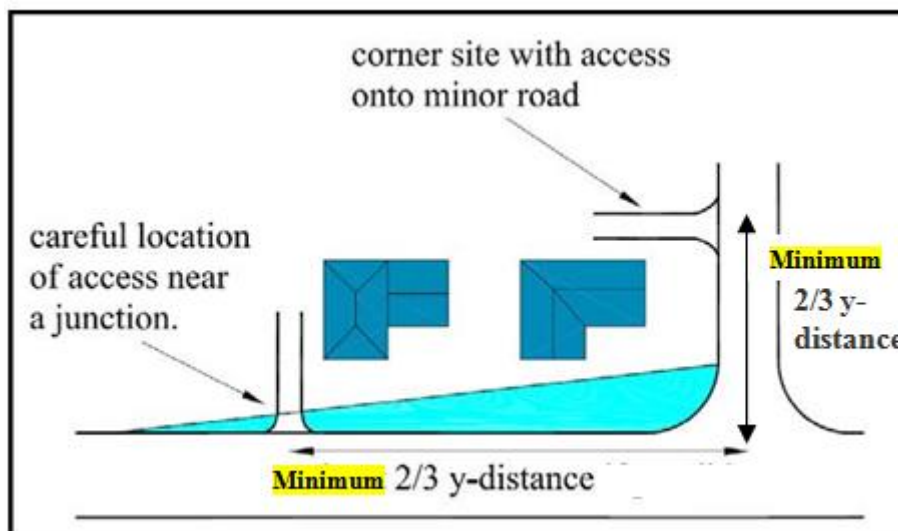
Envelope of Visibility Single Dwelling Access onto Public Road
